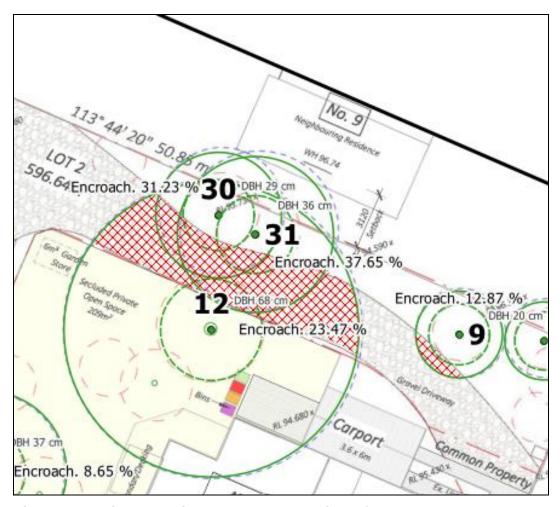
Driveway alignment and retention of Trees 9, 12, 30 and 31
